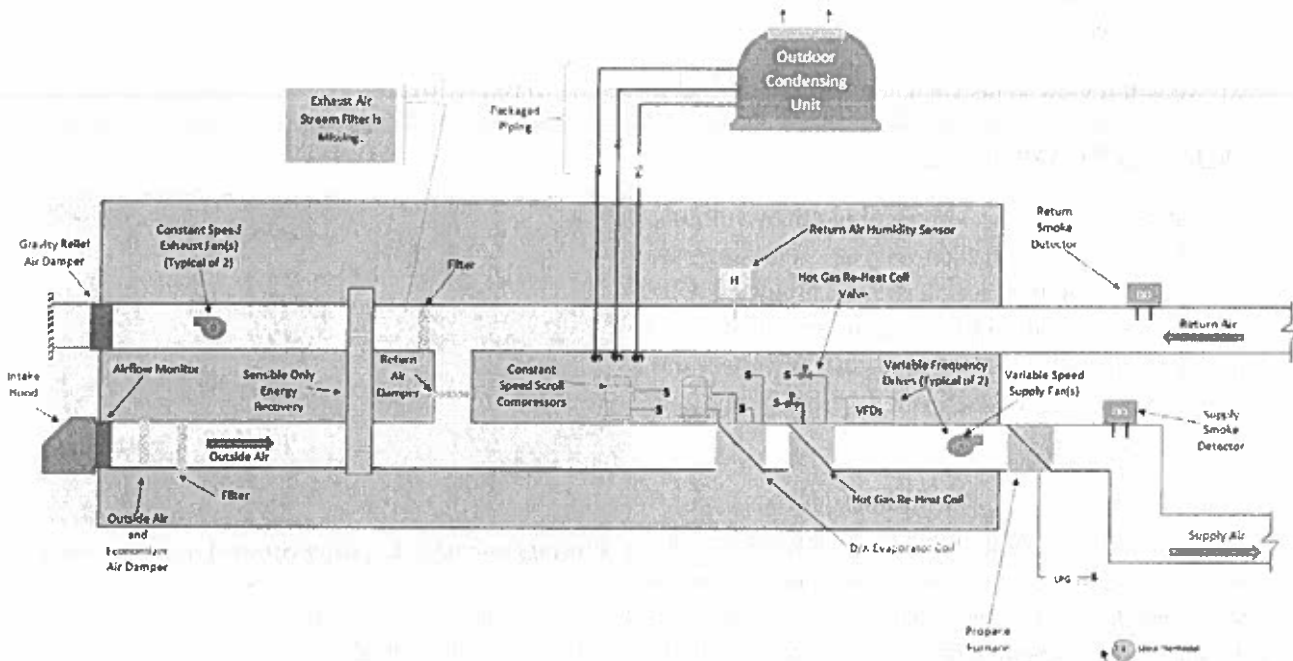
Typical Ground Mounted Packaged Rooftop Unit Schematic
